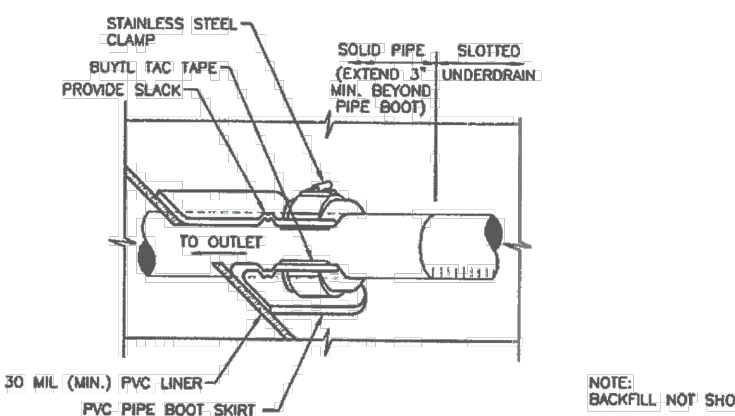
Geomembrane Liner/Underdrain Penetration Detail
